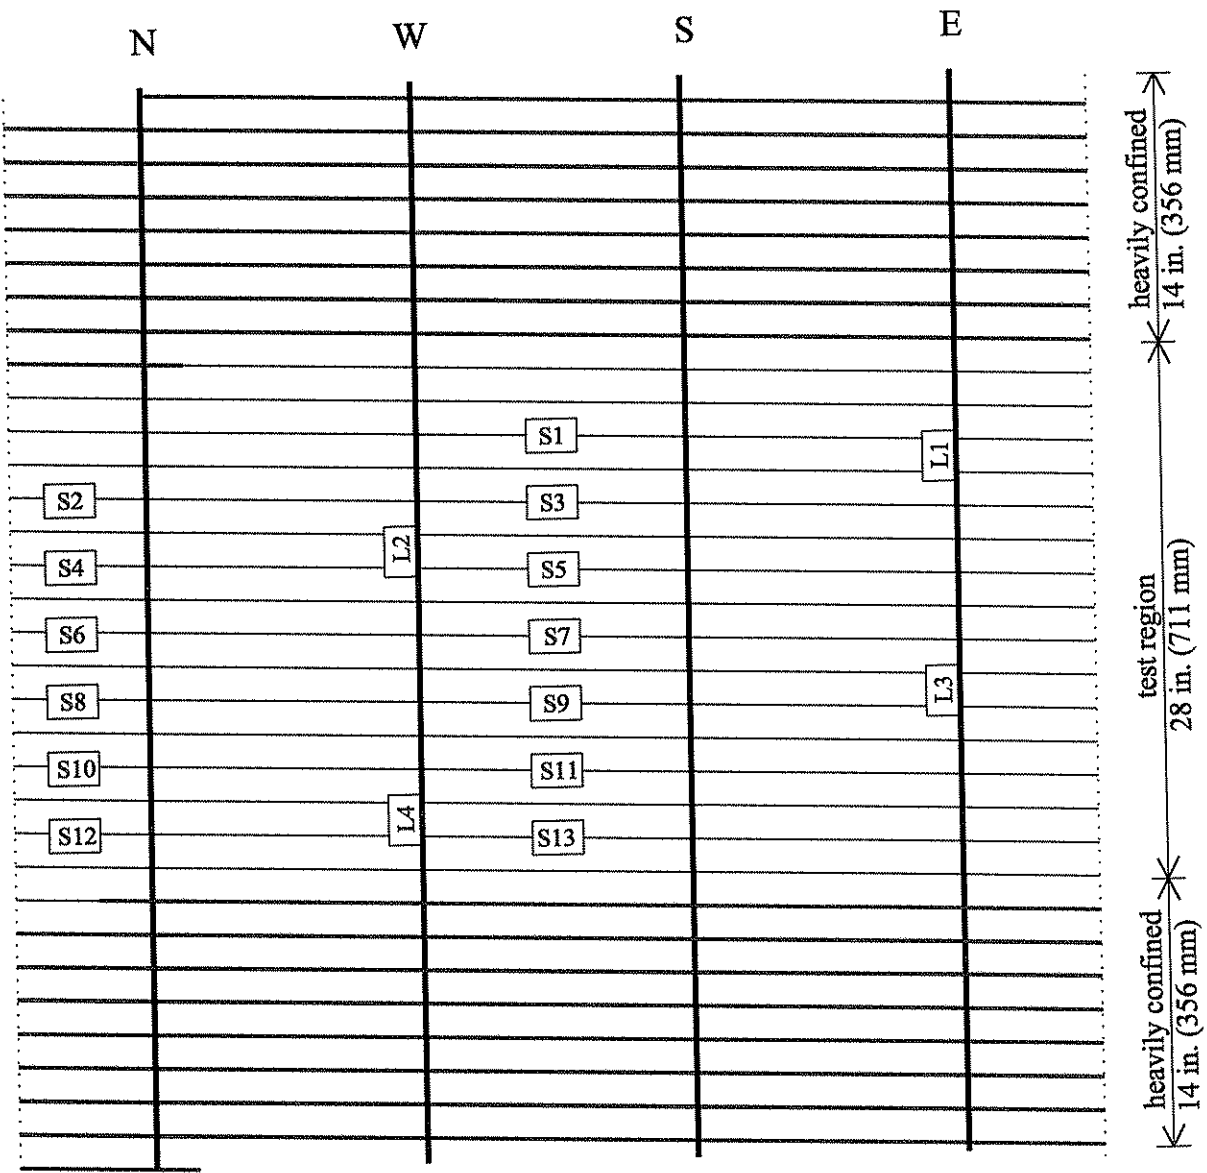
Typical pile reinforcing cage showing general layout of strain gages.
